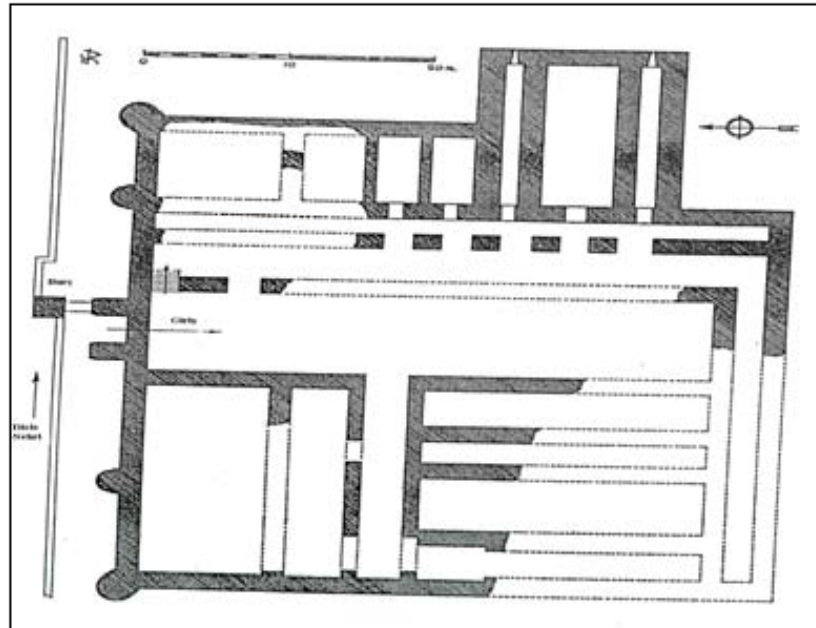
Plan of the Great Palace (Miynat, 2008: Plan 5)
